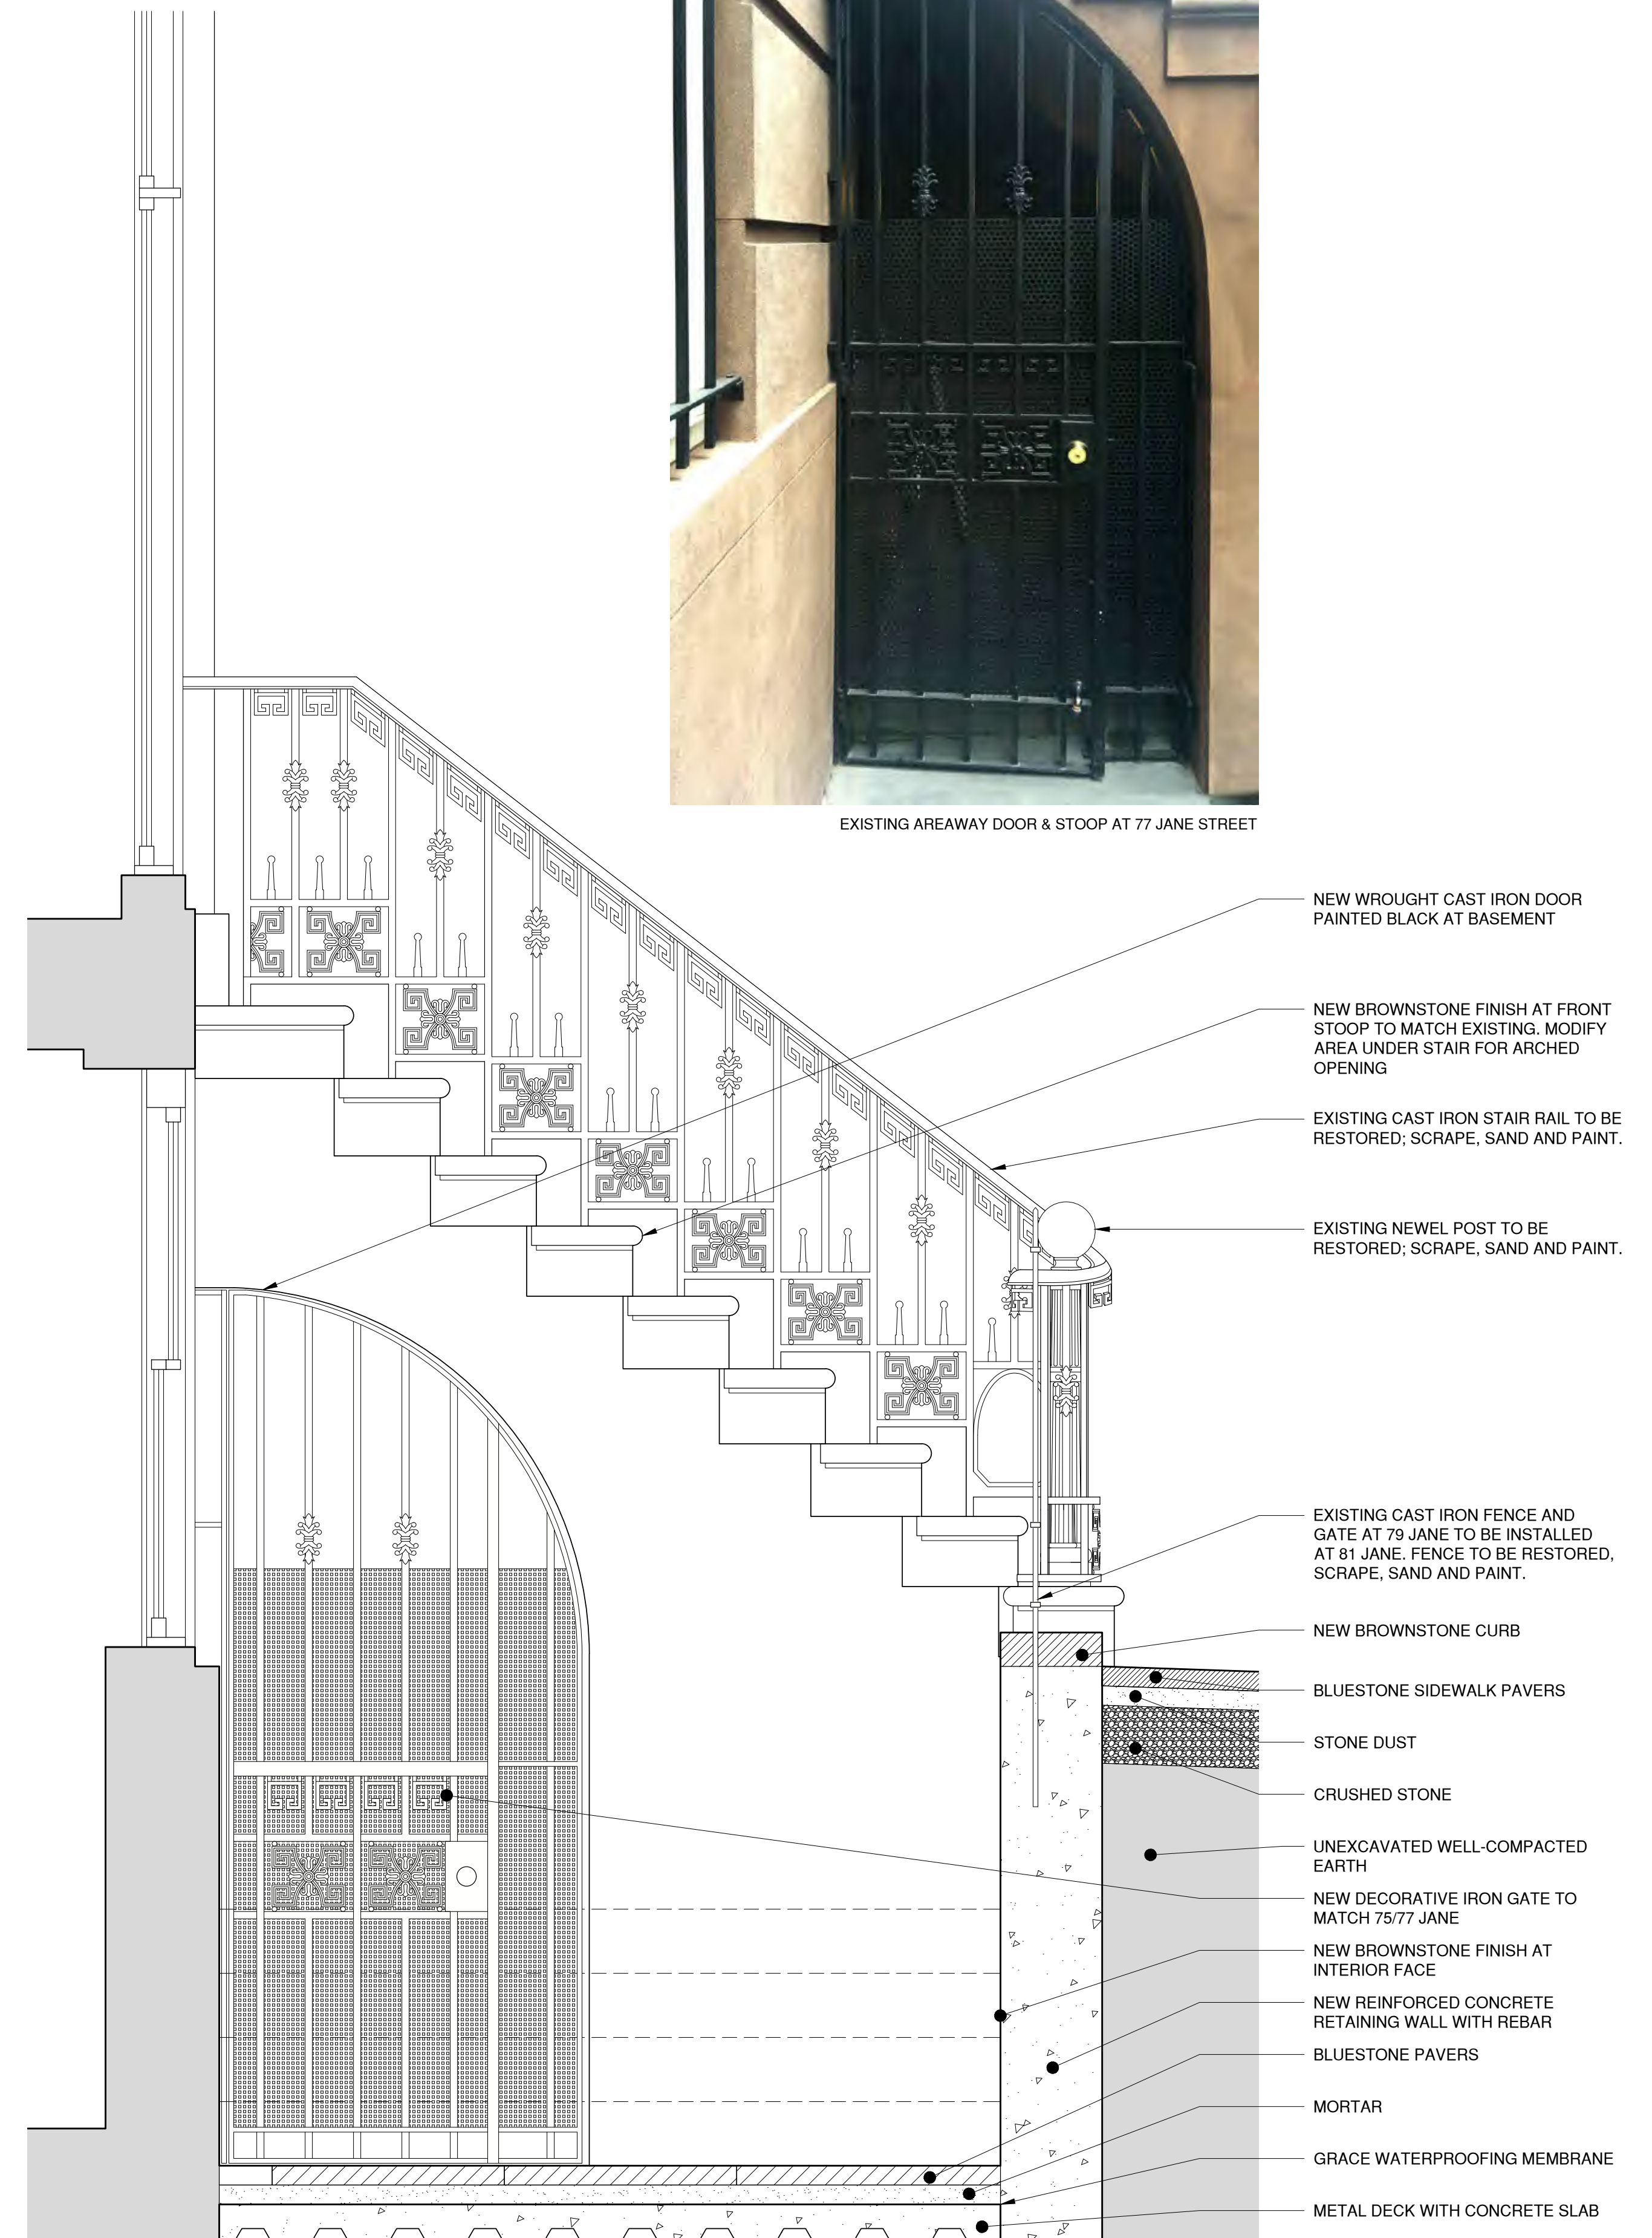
PHOTO OF EXISTING AREAWAY ENTRY & STOOP
